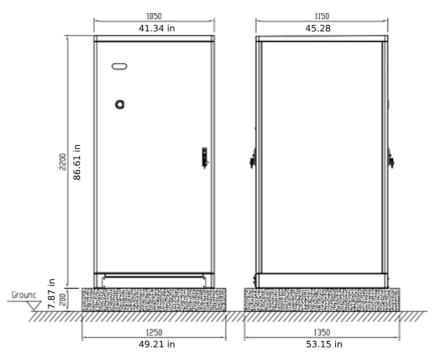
Expansion Bolt Fixing of Concrete Foundation
